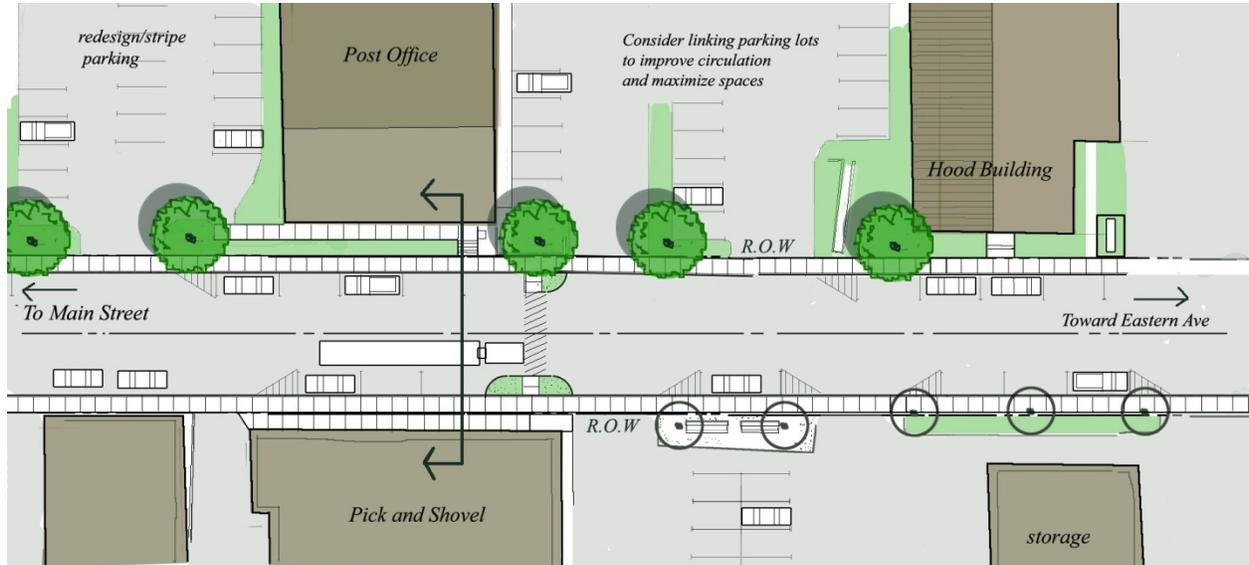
PLAN AND CROSS SECTION FOR COVENTRY ALTERNATIVE A
